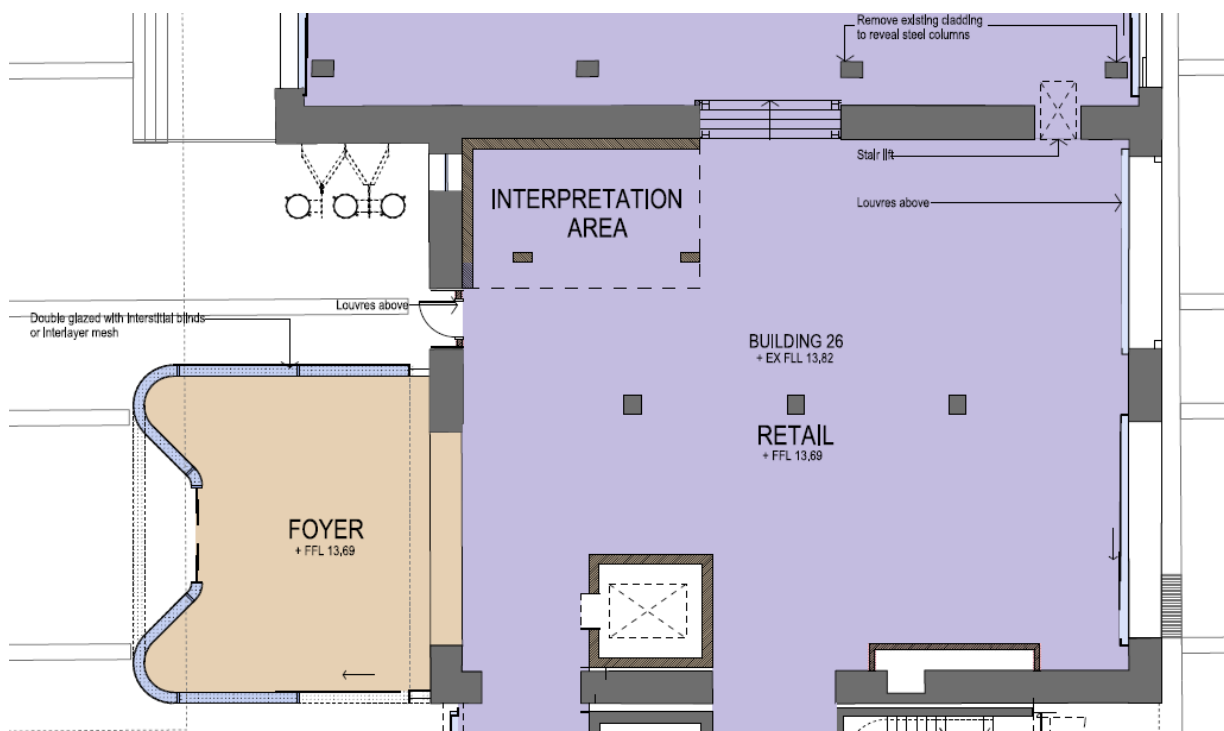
Part plan of proposed ground floor illustrating potential interpretation area.
